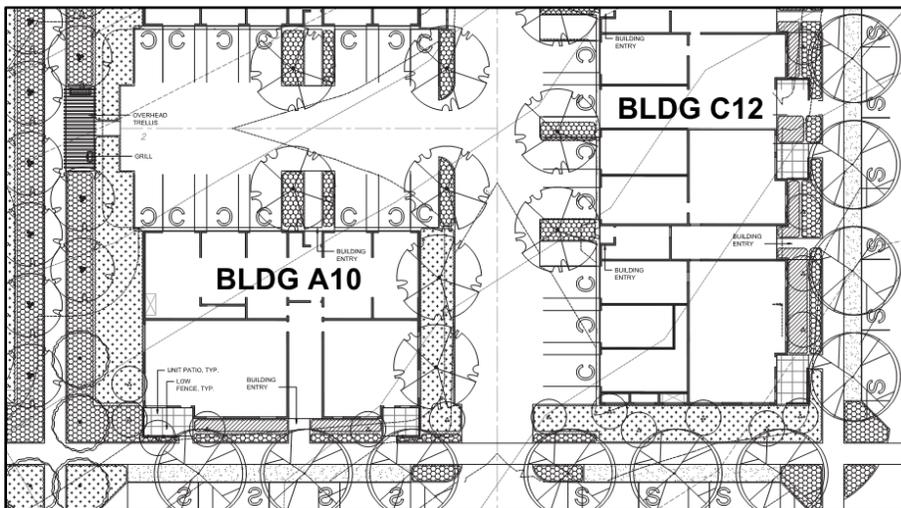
B. Residential units facing parking areas will have views of trees. End units will be provided with windows to provide views of green spaces.
